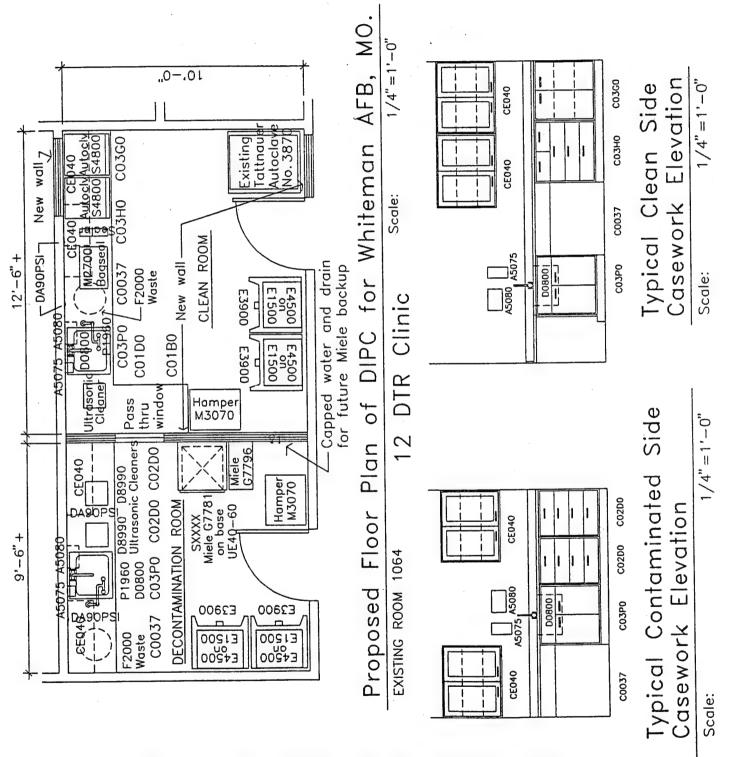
Medium Dental Instrument Processing Center Floor Plan
